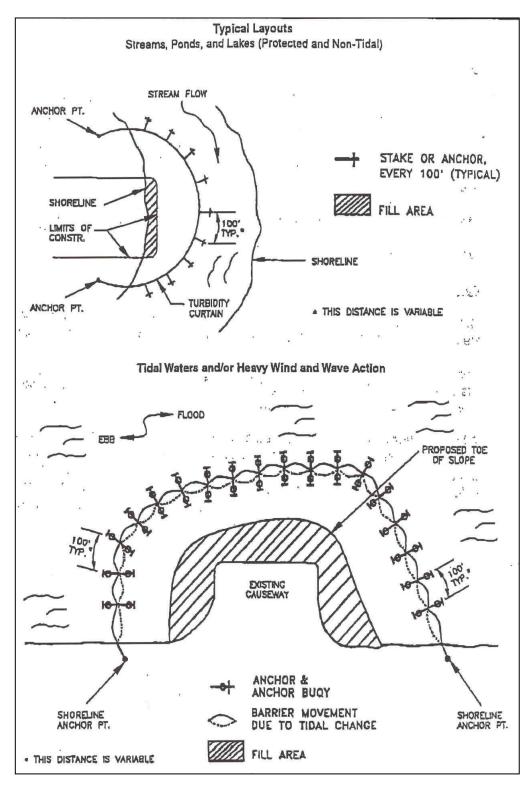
Typical Installation Layouts (Source Florida Department of Transportation Road and Design Specifications)
